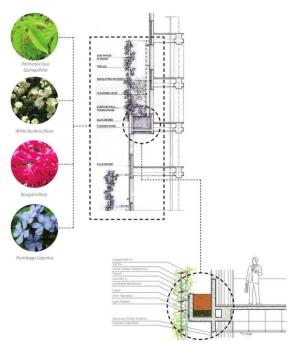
Detail of wall section showing the structural connections between plant stand, planter and building (Pastorelli, 2009)
